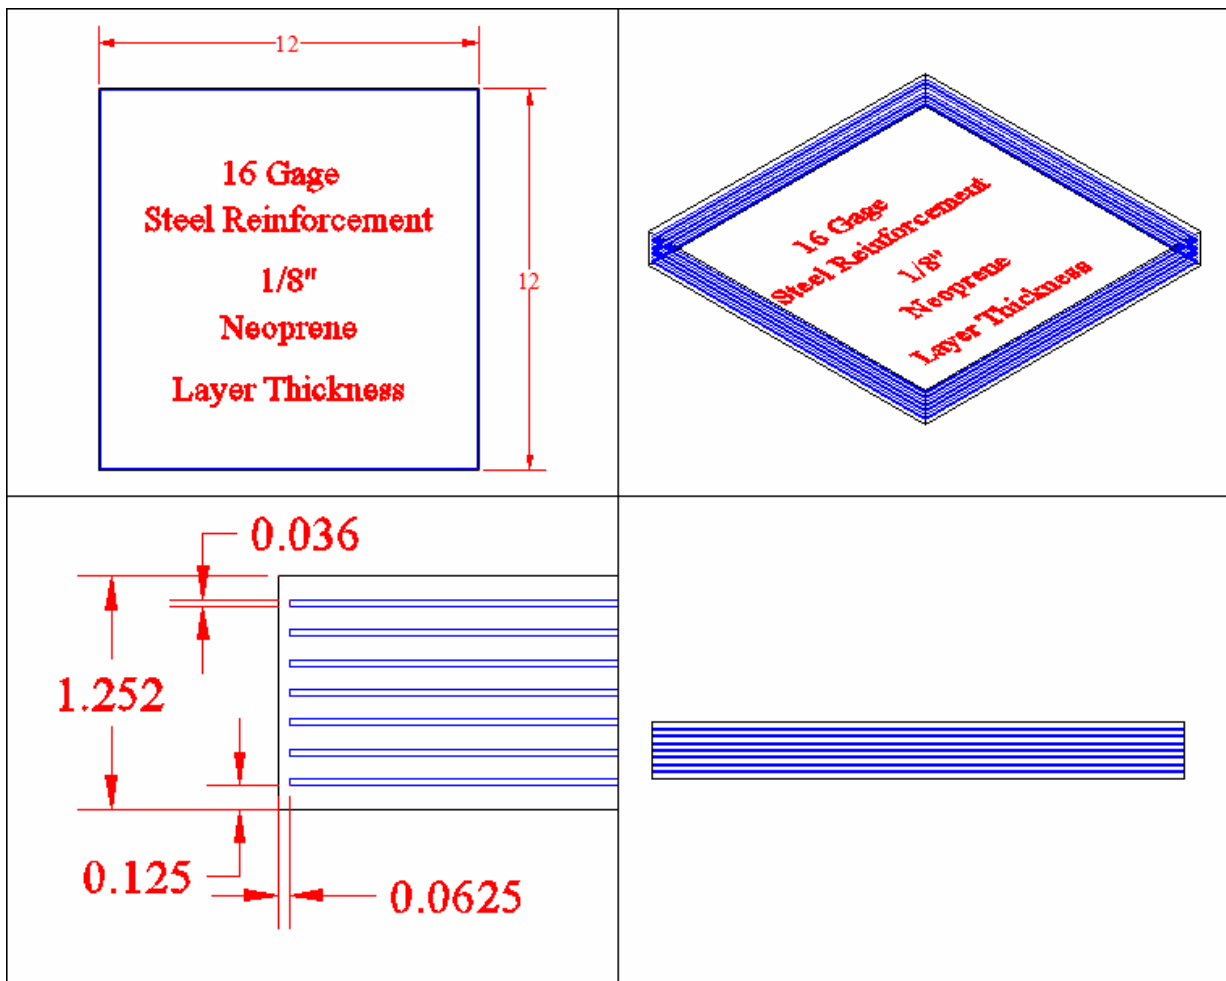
Pad design for shape factor of 24 (1 inch pad or SF-24 pad)
